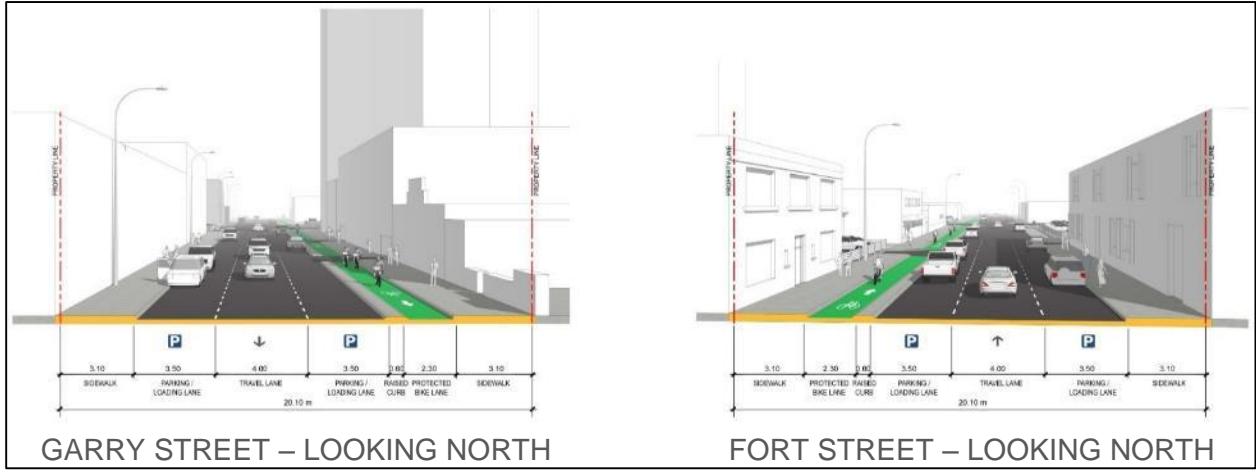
Option 3 - Wide One-Way Left Side Protected Bike Lanes on Fort Street and Garry Street
